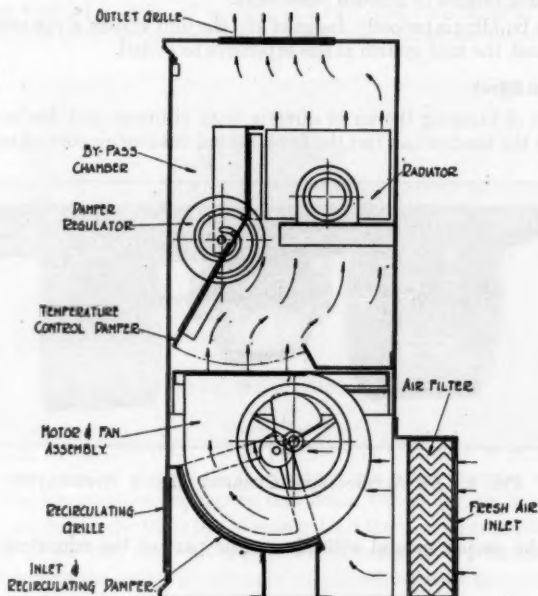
SECTIONAL VIEW OF A PRESENT-DAY UNIT
